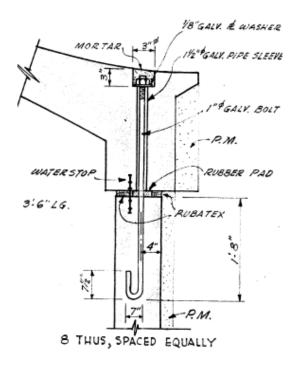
Dome Anchor Detail (Source Drawings: "North Valley 4.0 MG West Reservoir (A600001)")
